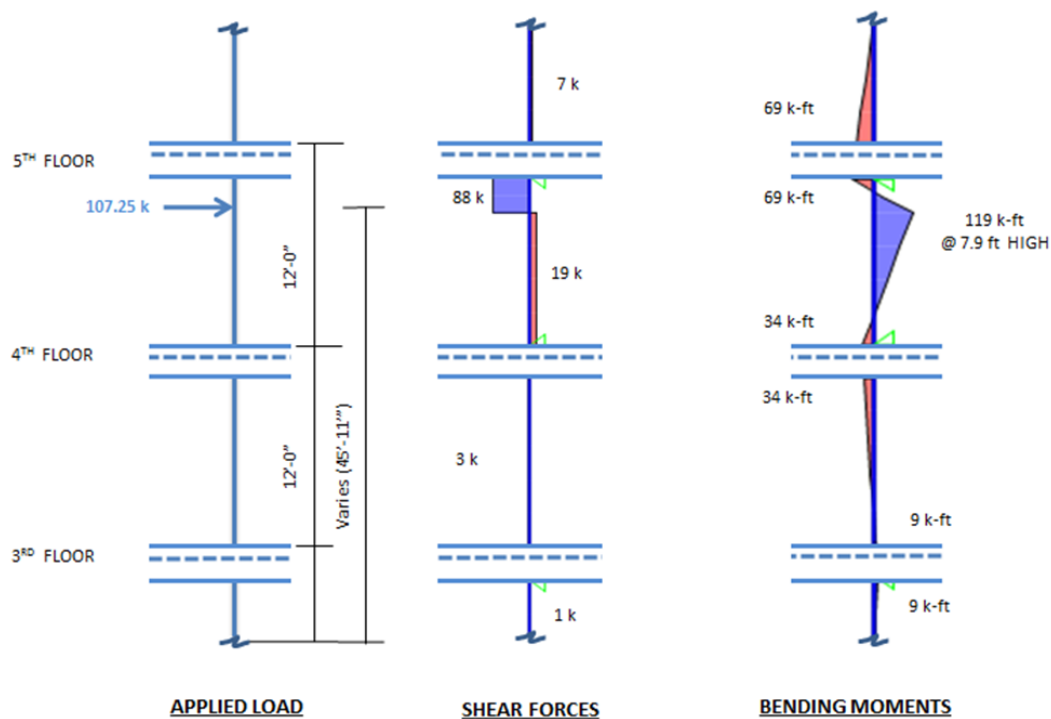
Impact load applied at "d" away from the end of column on the 4th floor
